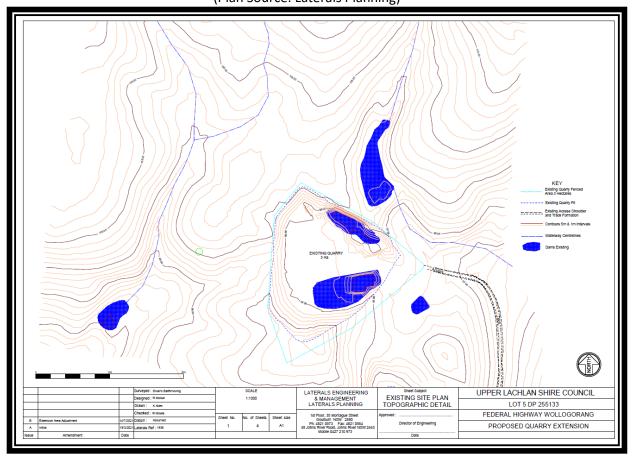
Existing Site - Topographic Map (Plan Source: Laterals Planning)
